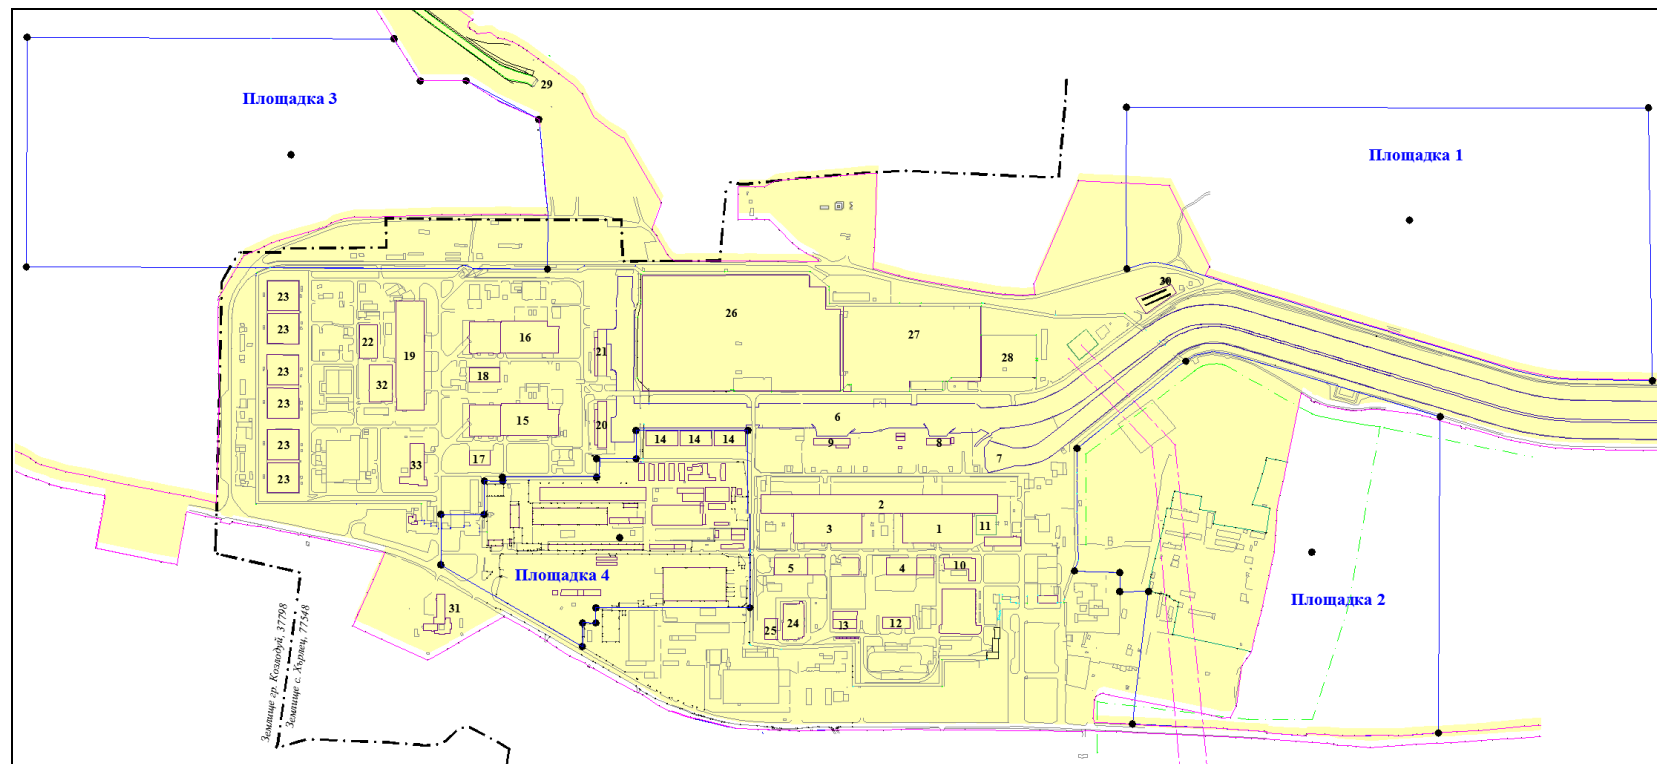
GENERAL PLAN OF THE KOZLODUY POWER PLANT AND DISPOSITION OF THE PROPOSED SITES OF THE NEW NUCLEAR UNITS
